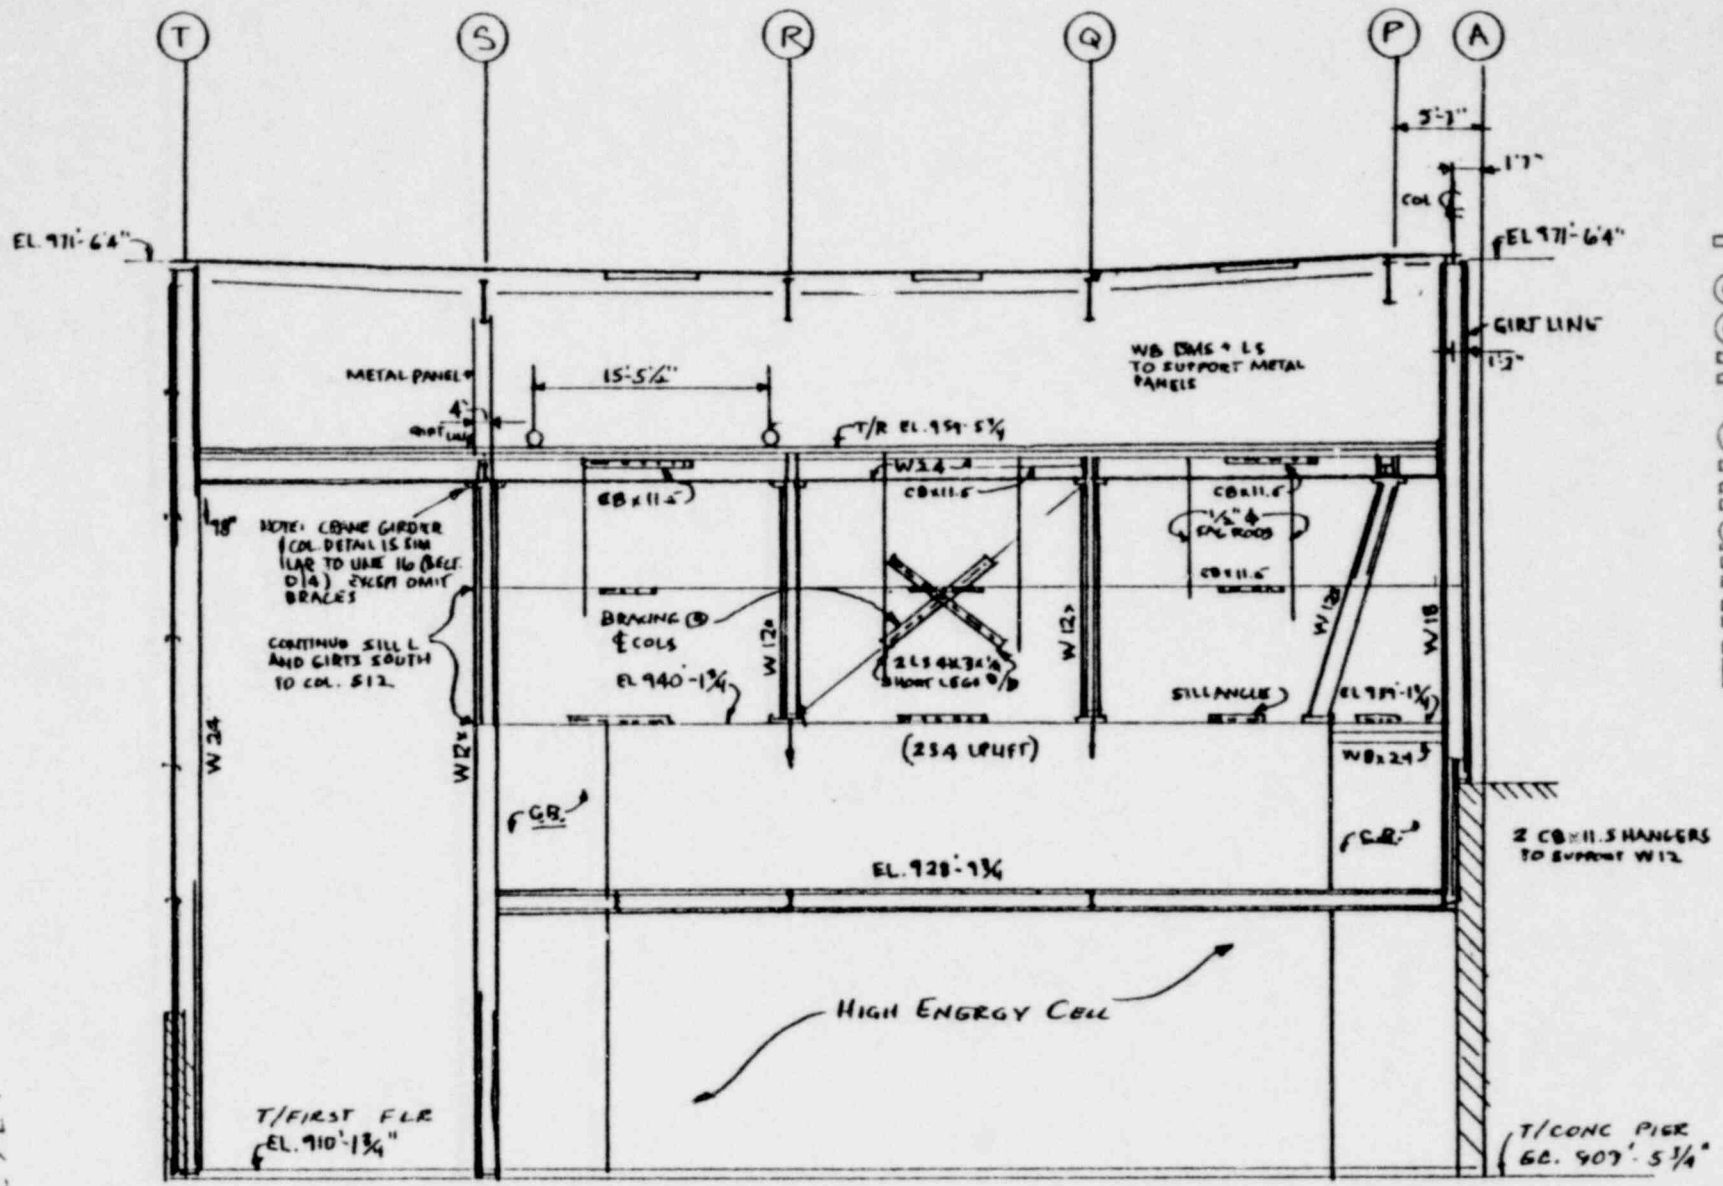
JN-1B CROSS BRACING FOR CRANE FRAMING AT LINE 13
